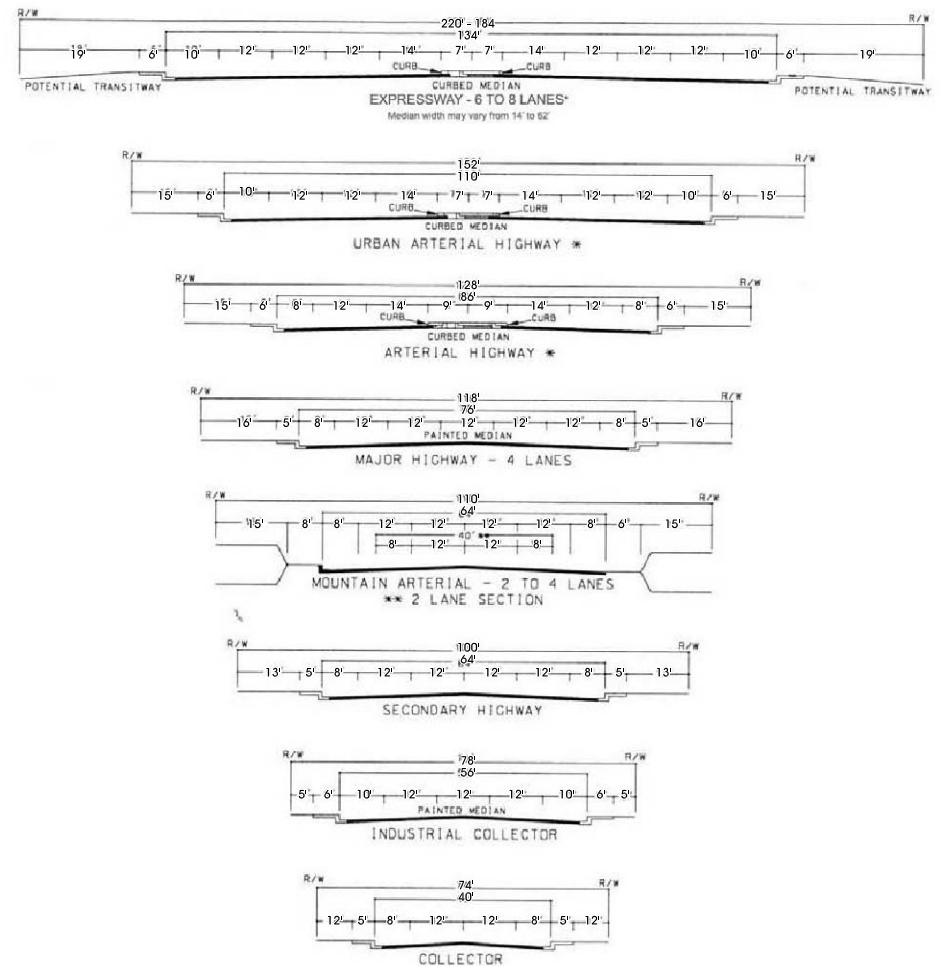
B RIVERSIDE COUNTY GENERAL PLAN CIRCULATION ELEMENT AND STREET CLASSIFICATION CROSS-SECTIONS
